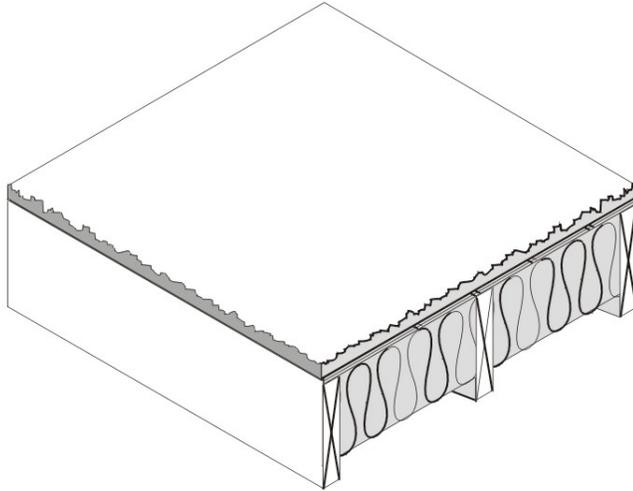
Wood Framed Floor with a Crawl Space
